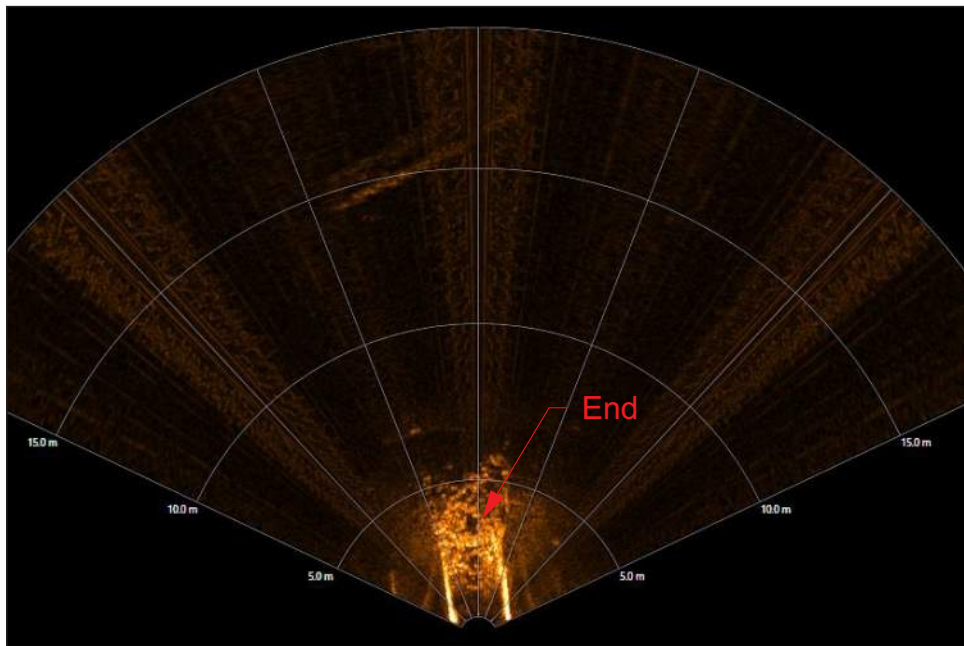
Sonar image at 784 feet downstream of Access Point 1. End of outlet 12 feet ahead.
